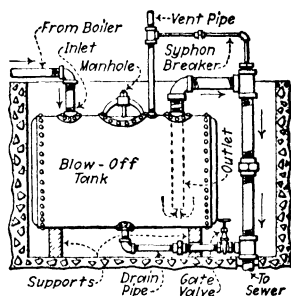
Typical blowoff tank with piping pertaining thereto.
